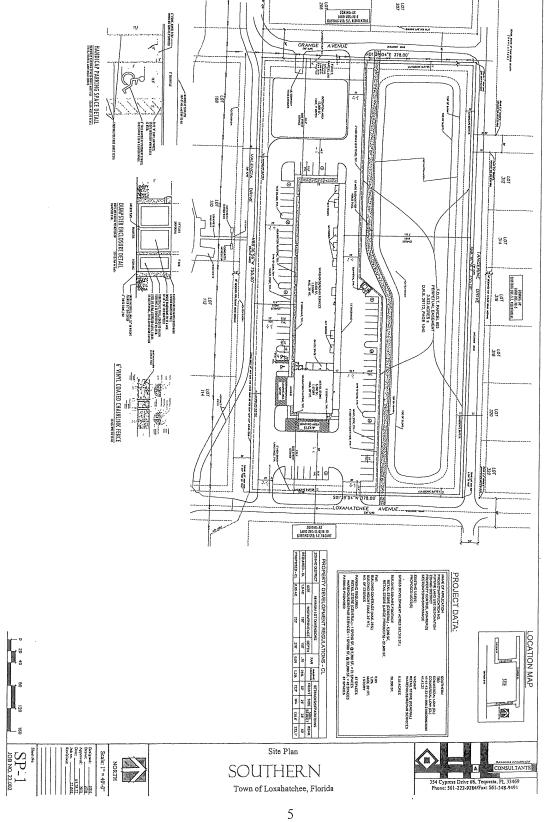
EXHIBIT C Southern Lawn Equipment Site Plan Amendment Conditions of Approval
